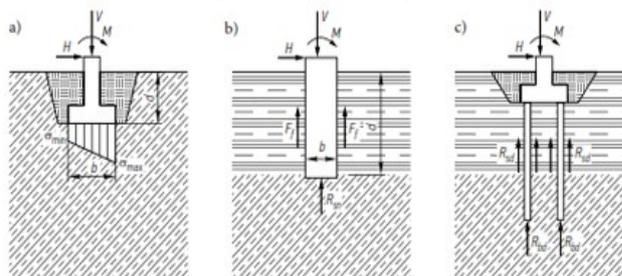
Foundation types: a) shallow belt foundation b) deep foundation c) pile foundation (Ramoškevičiūtė 2013).
